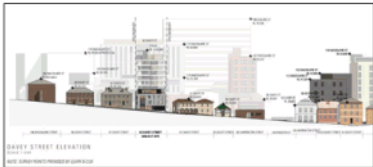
Derry Street streetscape, illustrating surrounding buildings and variable heights (source: JAWS Architects)
